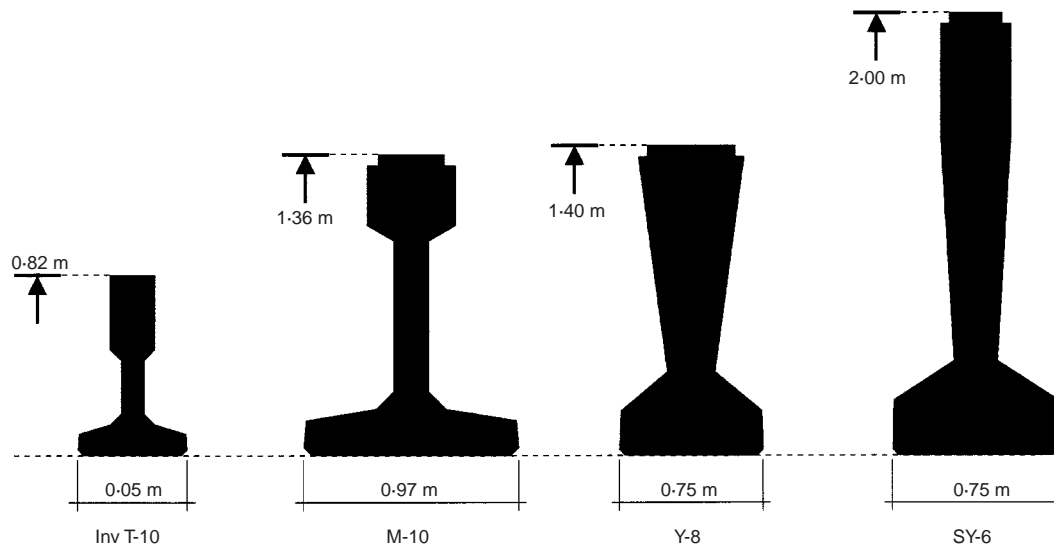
The development of precast beam sections: the T-10, M-10, Y-8 and SY-6 beams
